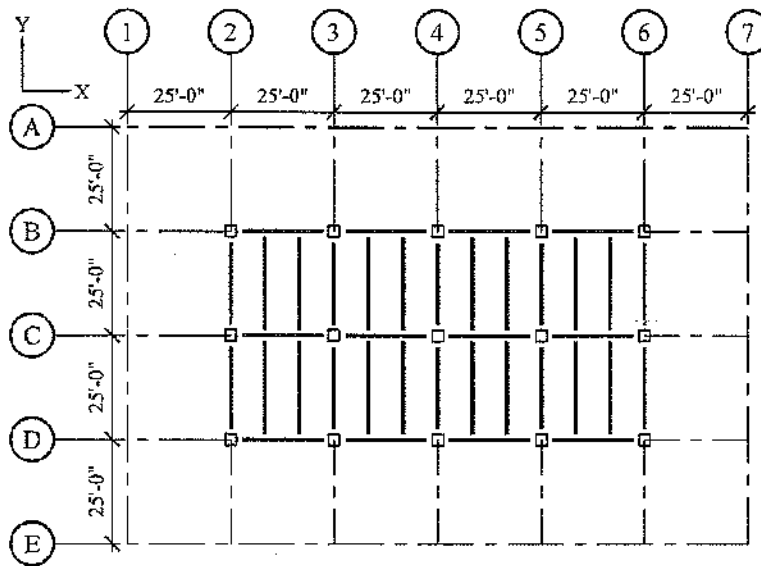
Penthouse roof framing plan (1.0 ft = 0.3048 m)
